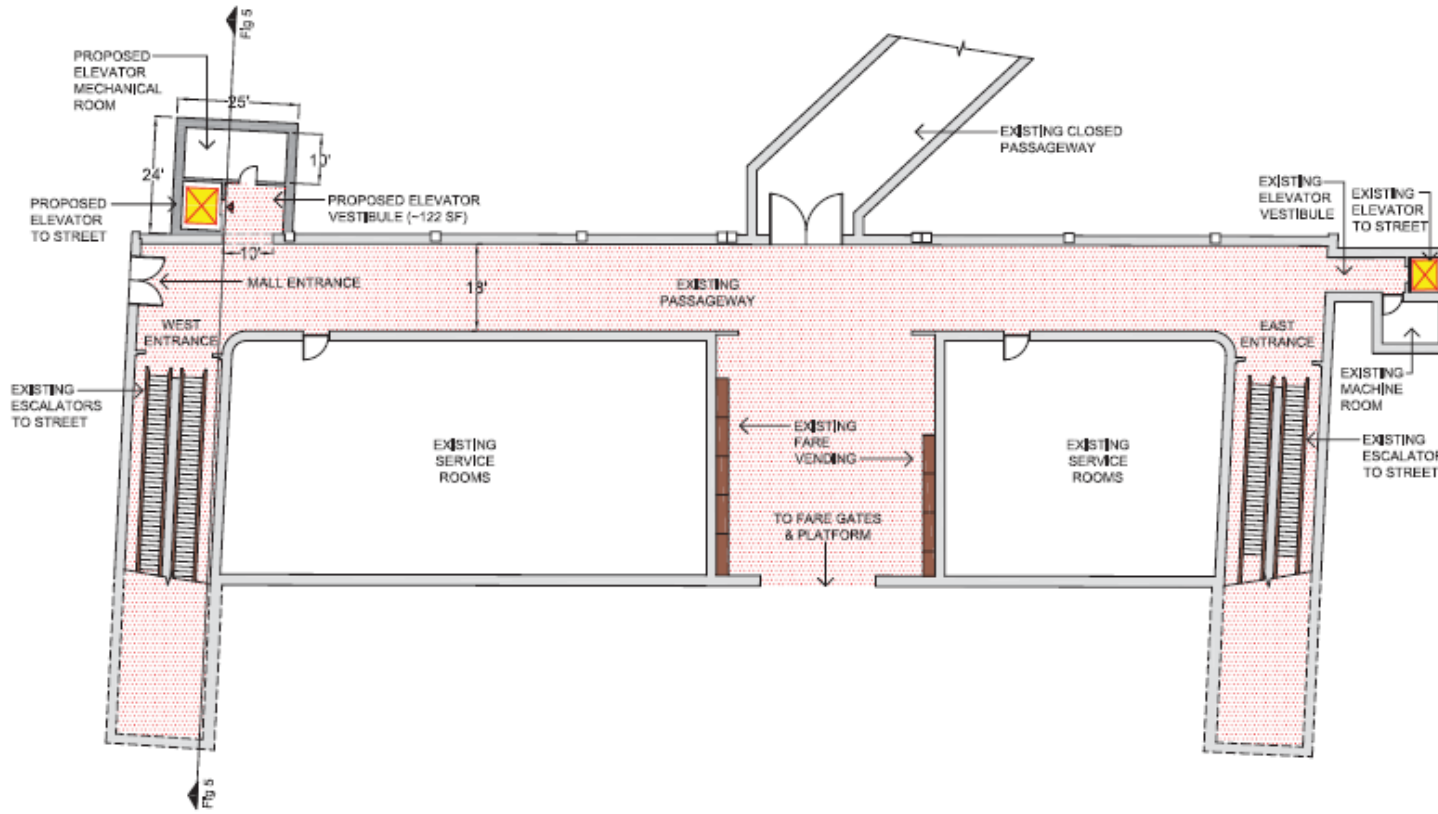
Existing Conditions - Passageway/Mezzanine Level
